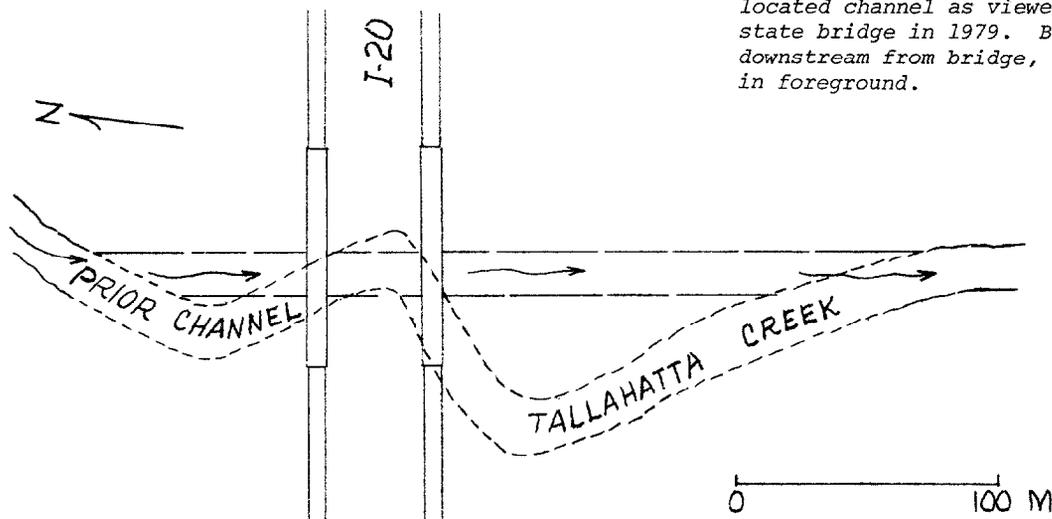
Plan sketch of Tallahatta Creek channel relocation.
